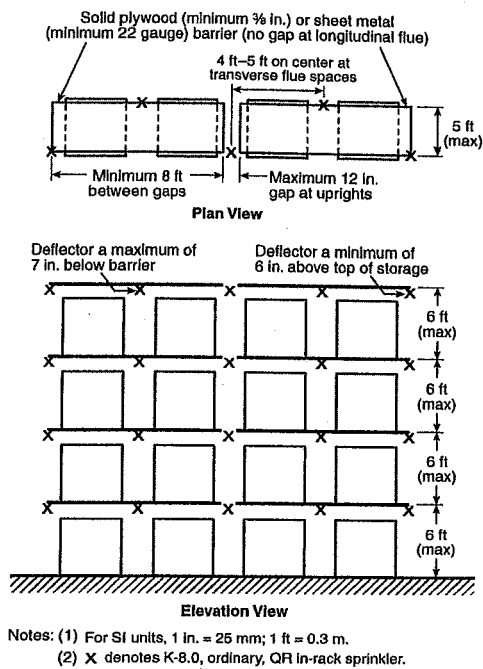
(b) Single-Row Rack Sprinkler Layout for Design Scheme “B” — Sprinklers on Face of Rack. [30: Figure 16.6.2.1(b)]
